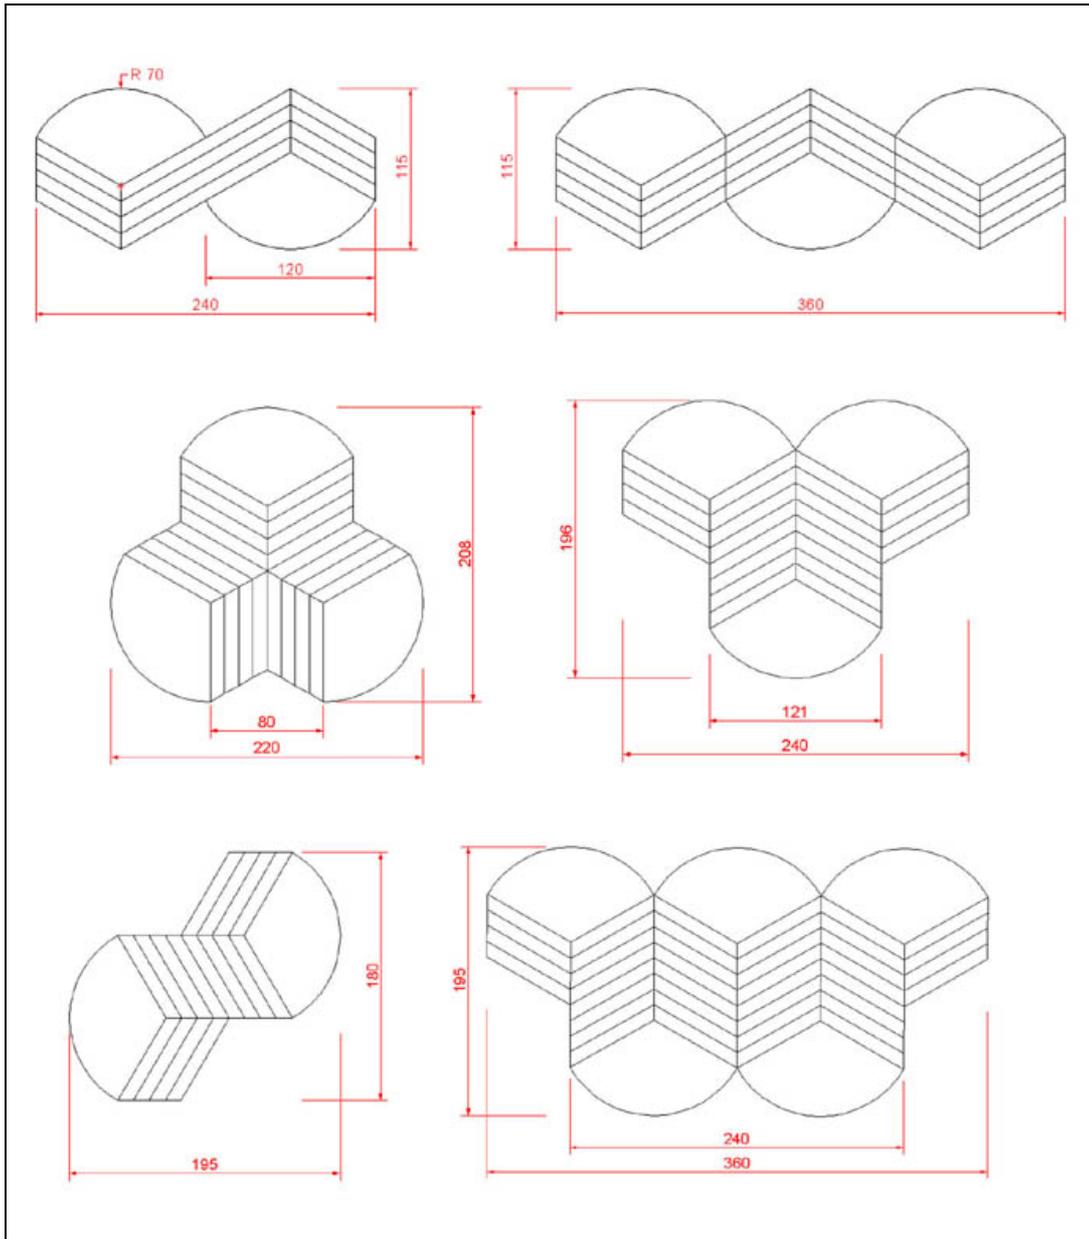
Technical Drawings of Patterns Constituted By One Leaf Unit
